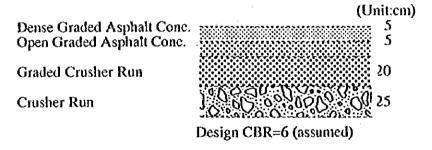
Standard Cross Section of Yard, Apron
